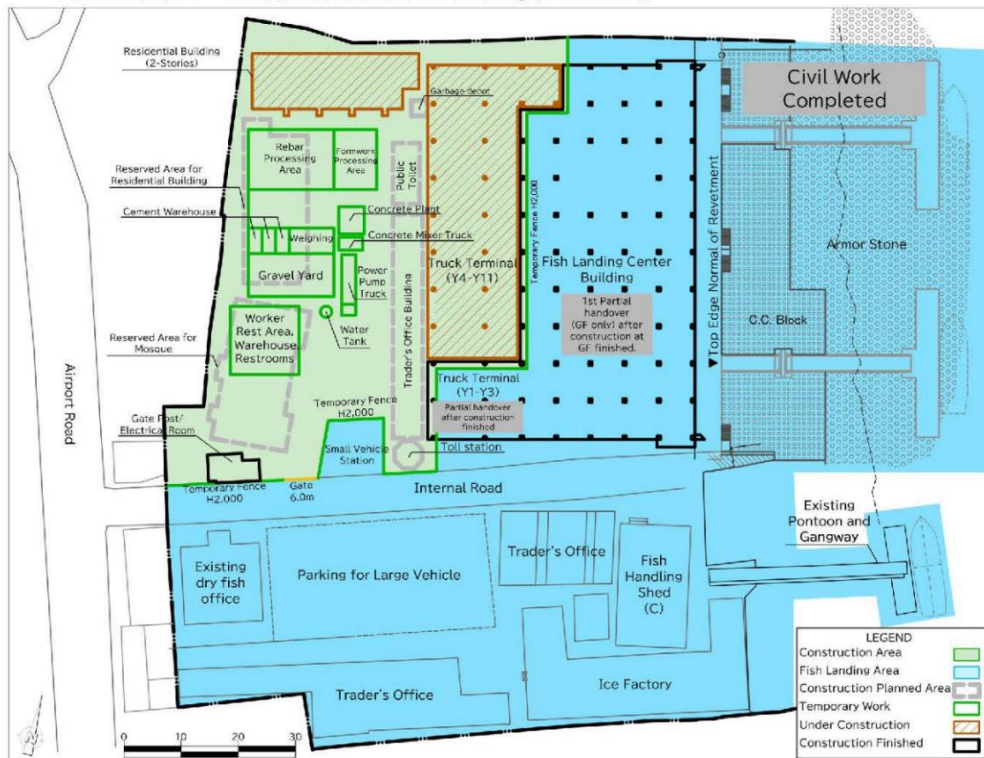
Temporary construction plan for each phase of building construction, (3) and (4)
